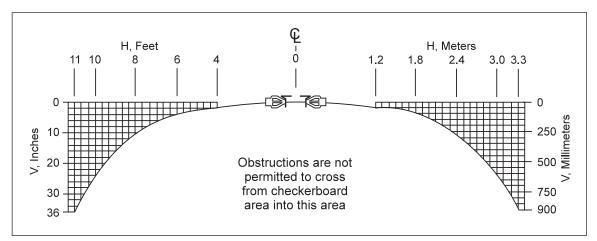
Obstruction area to umbrella pattern away from the mounting wall of sidewall Nonstorage sprinklers (not extended-coverage)
